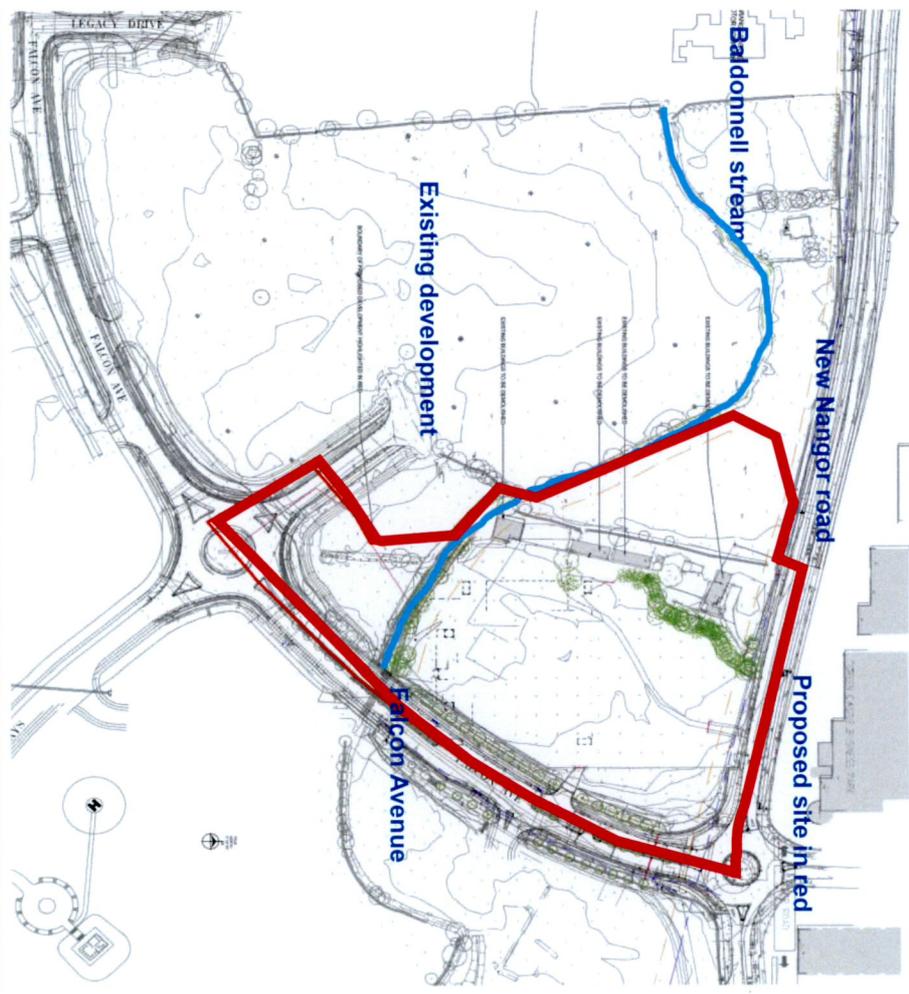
Existing Site Plan, with Proposed Site outlined in Red
